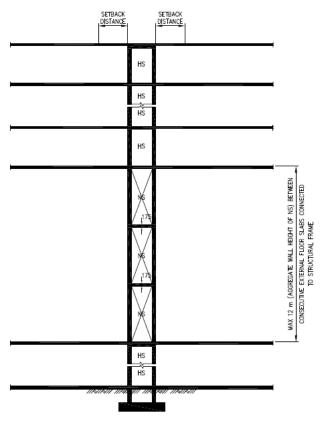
D - Section – Household Shelters And Non Shelters In Household Shelter Tower
